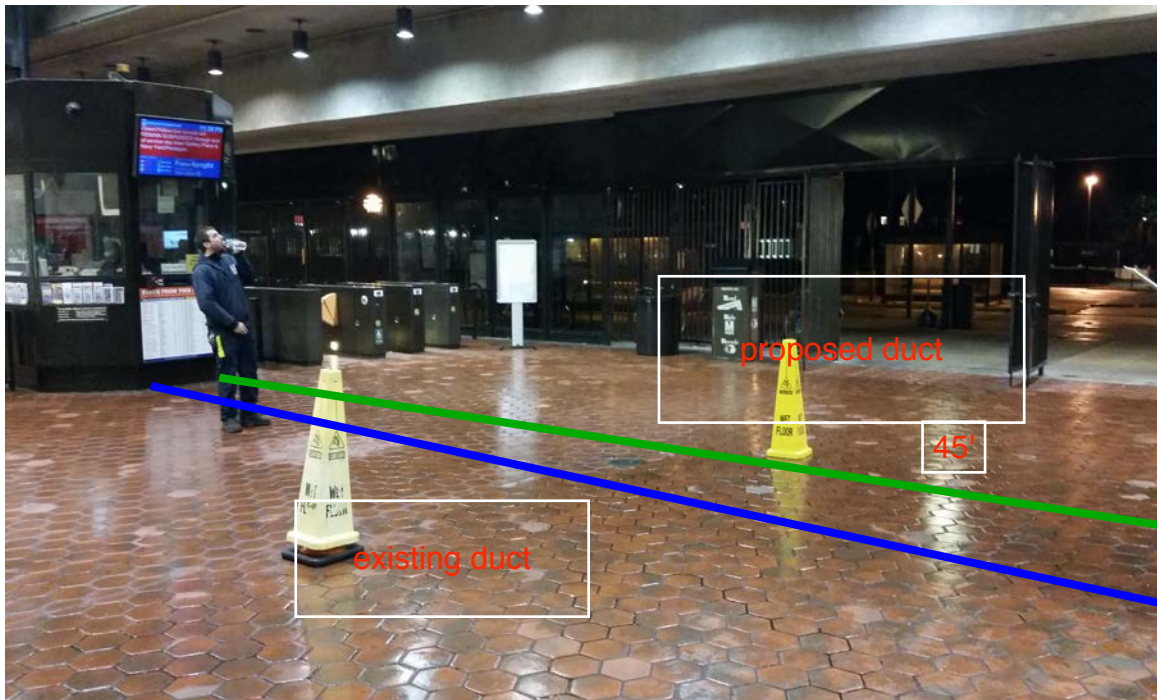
C12 Braddock Road: Existing duct run towards backroom corridor and proposed duct to proposed handhole.
